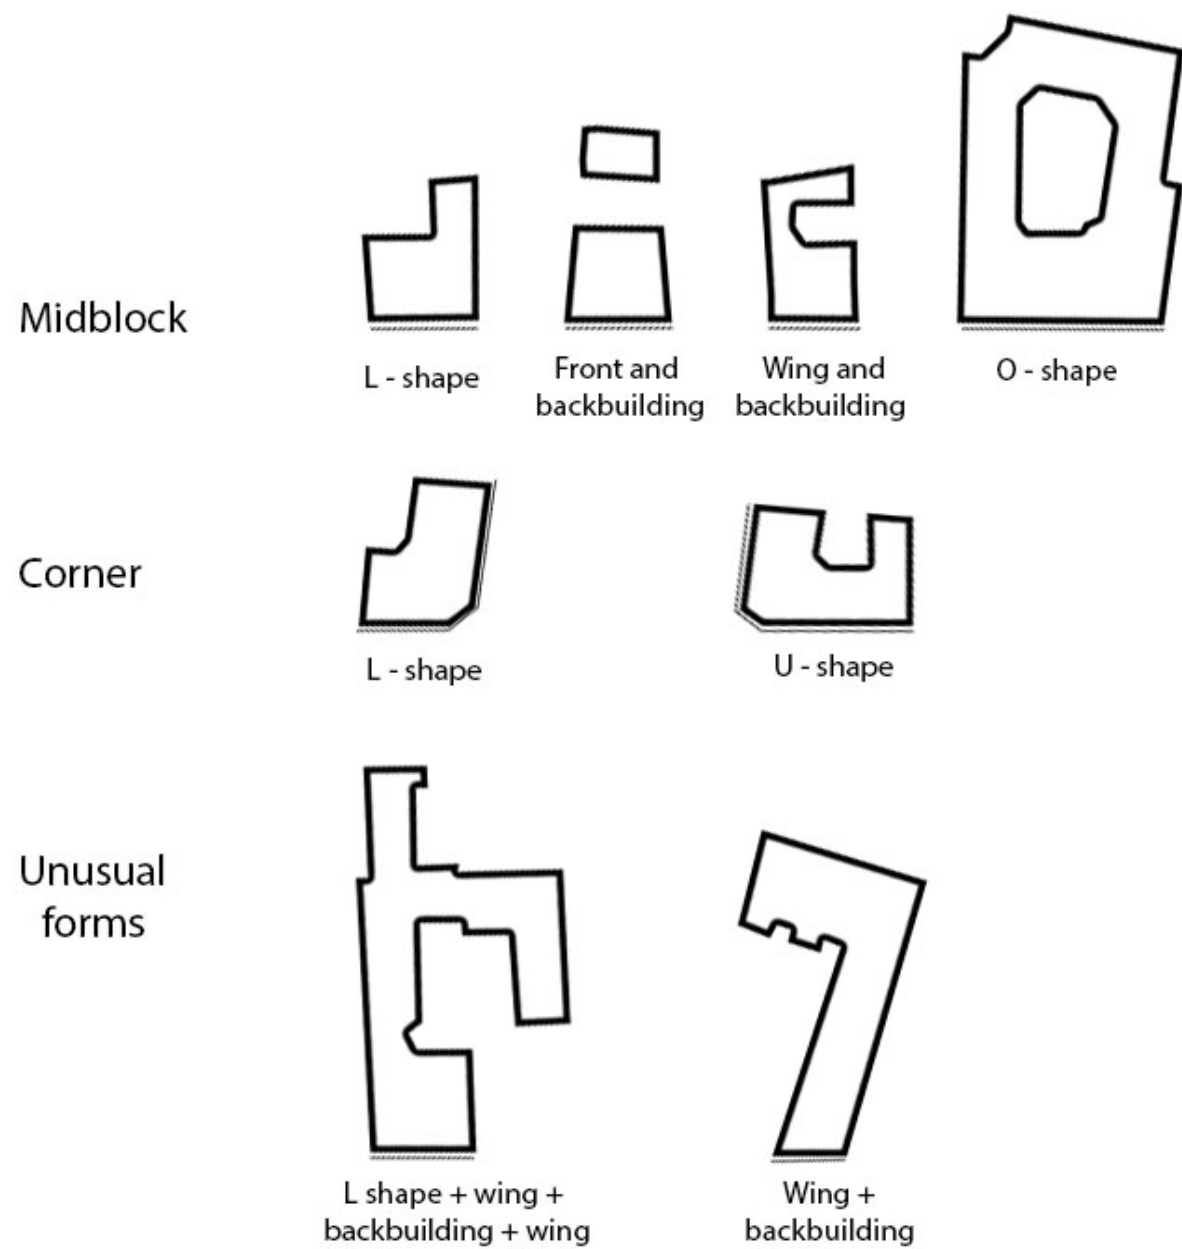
Typical footprints for Golden Era apartment houses and relation to street. Image by the Author.
